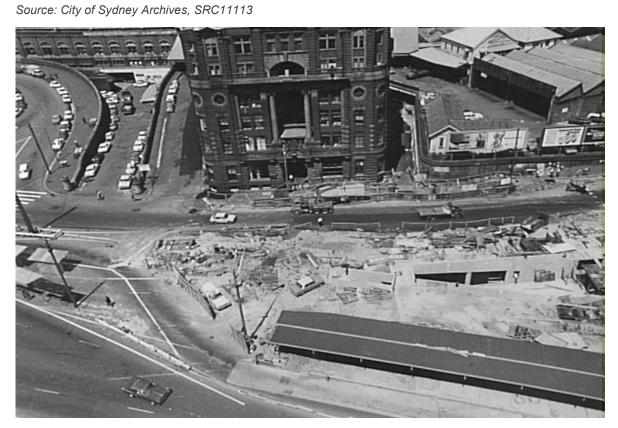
Devonshire Tunnel construction, Railway Square, 1975
